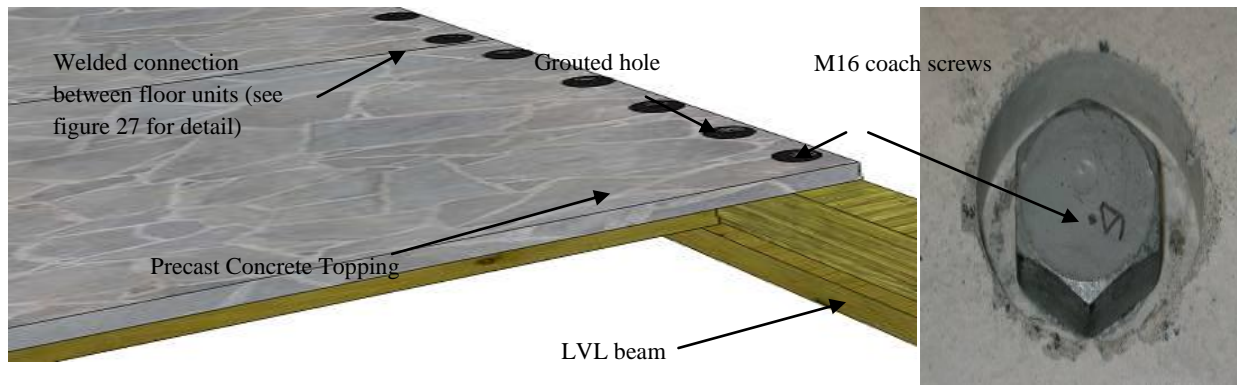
(a) Floor diaphragm connections to beam (b) Top view M16 coach screws
